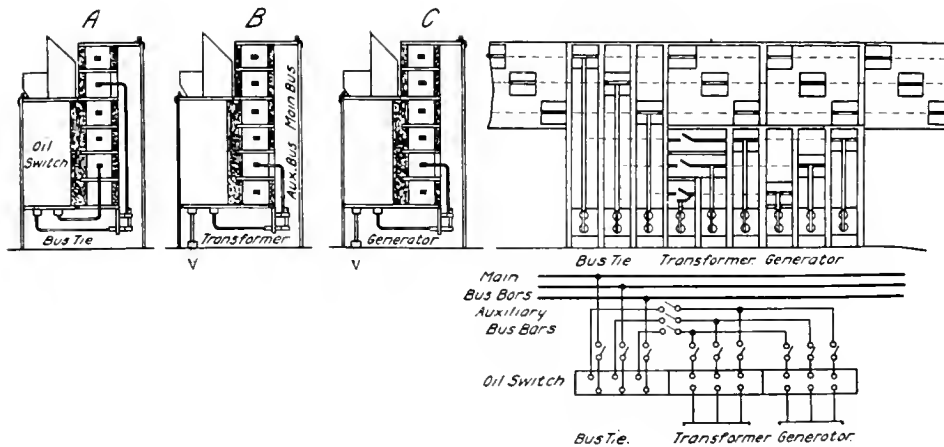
Arrangements wherein the Switch and Bus Equipments are located on the floor. Electrically these connections are identical to those of Fig. 5
